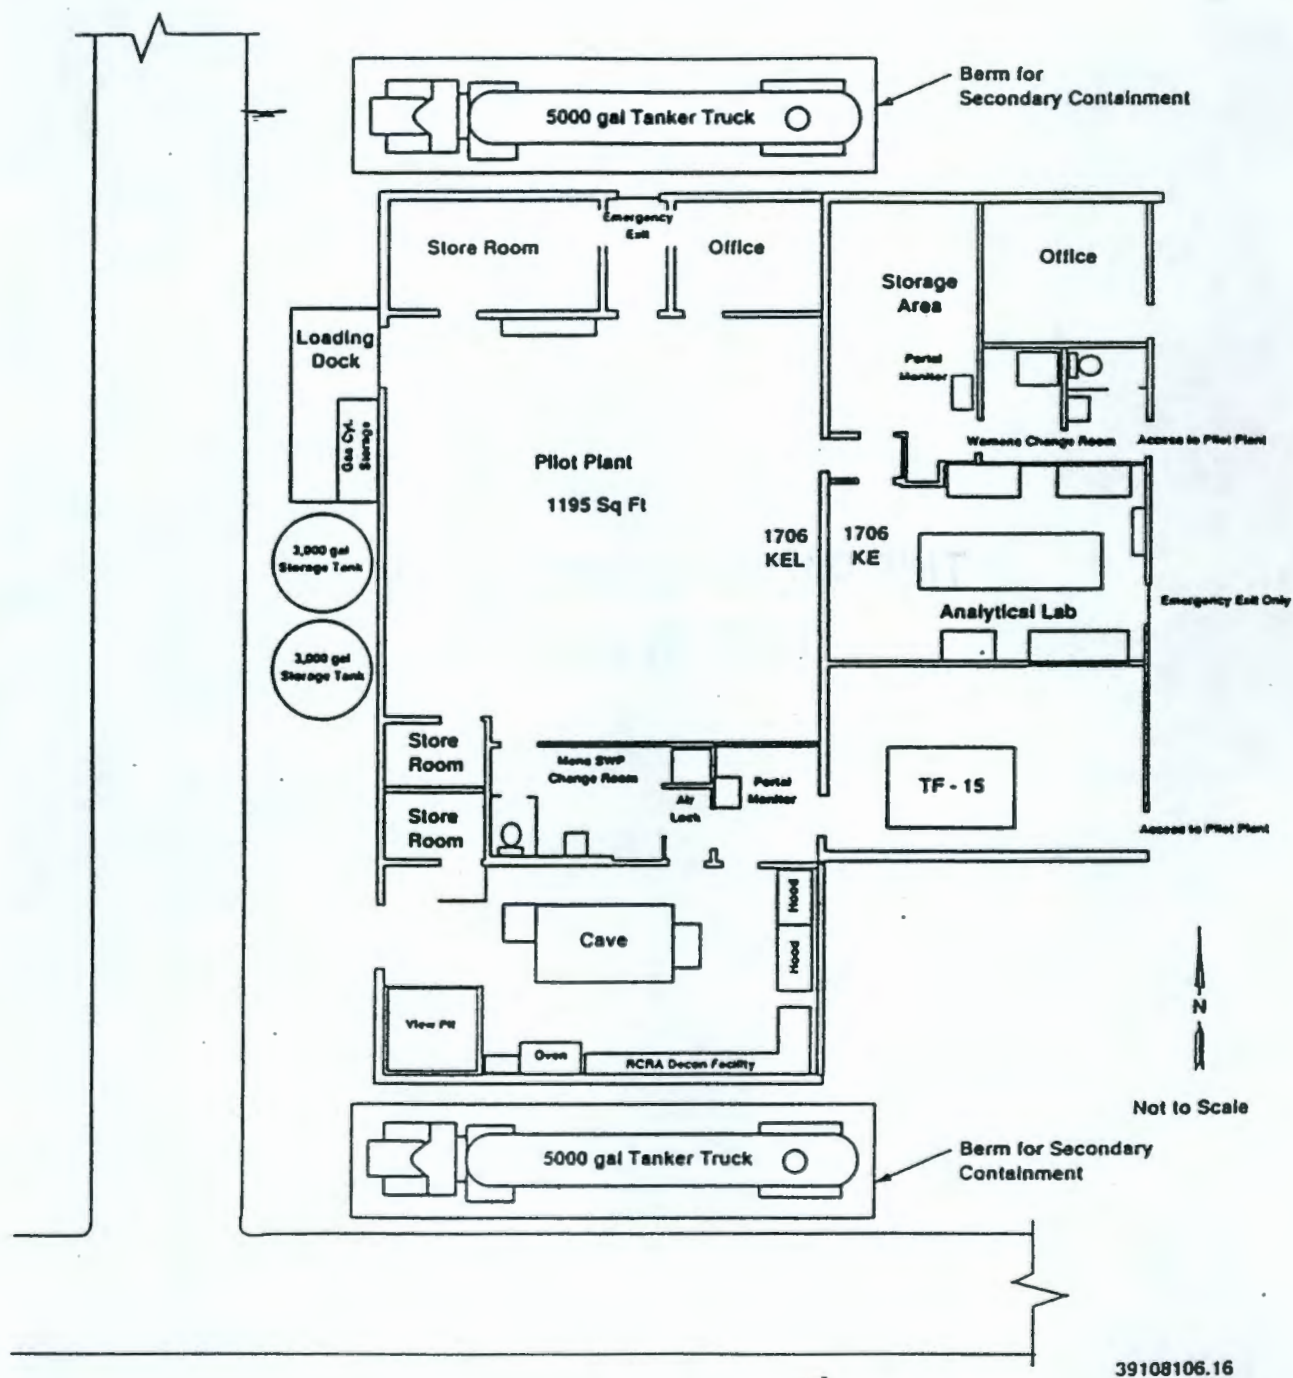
Waste Water Pilot Plant Floor Plan.
